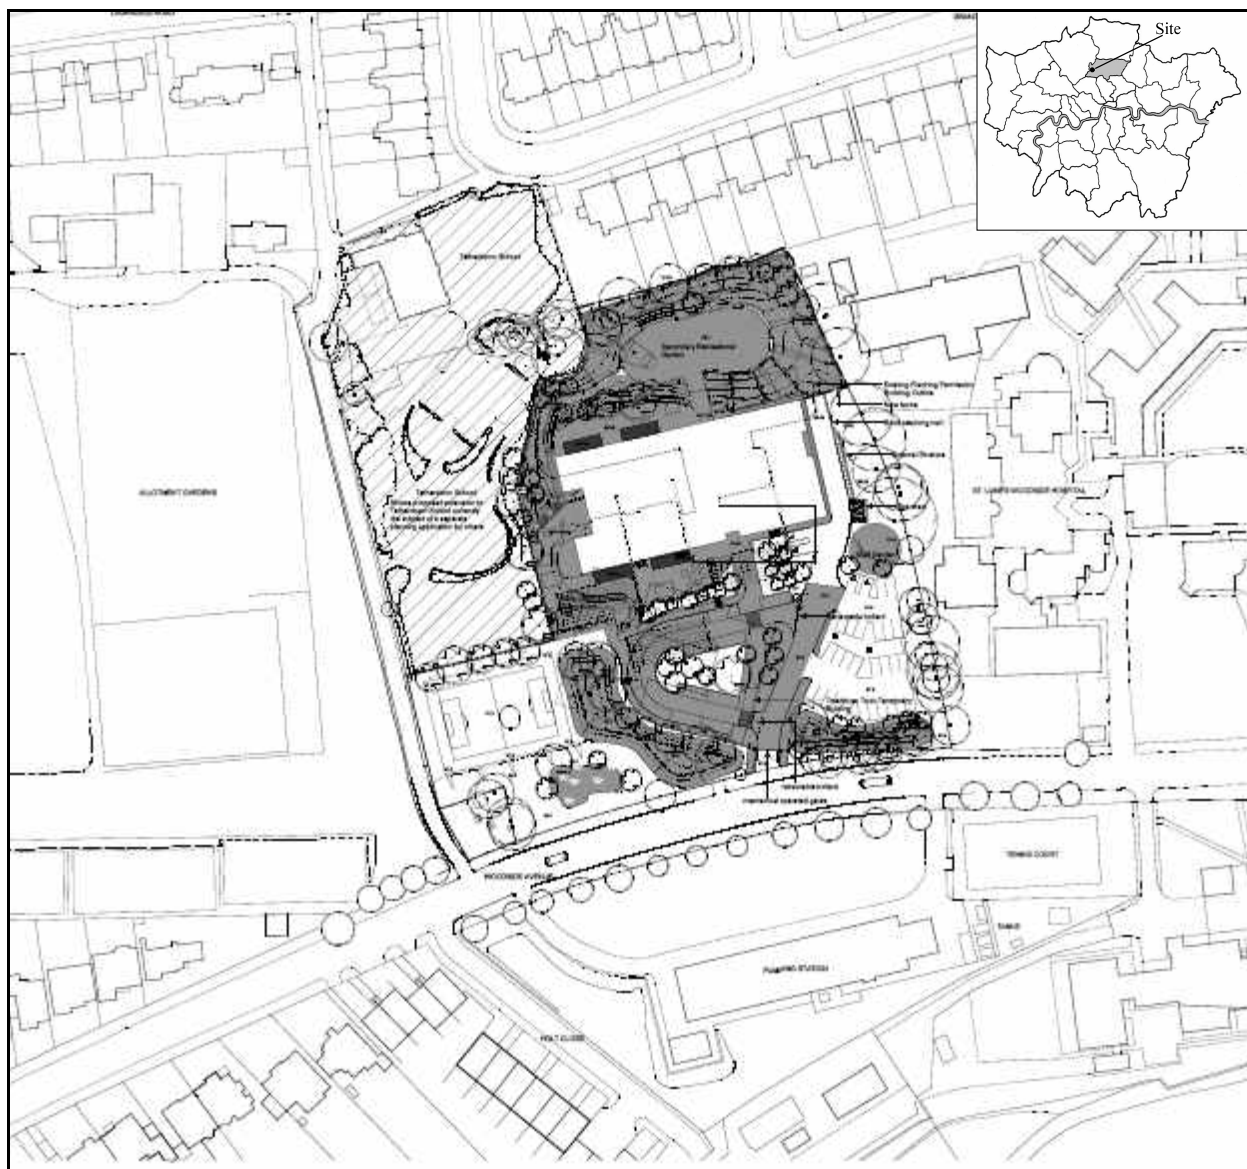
Site Location Plan © Crown Copyright MC/98/38
